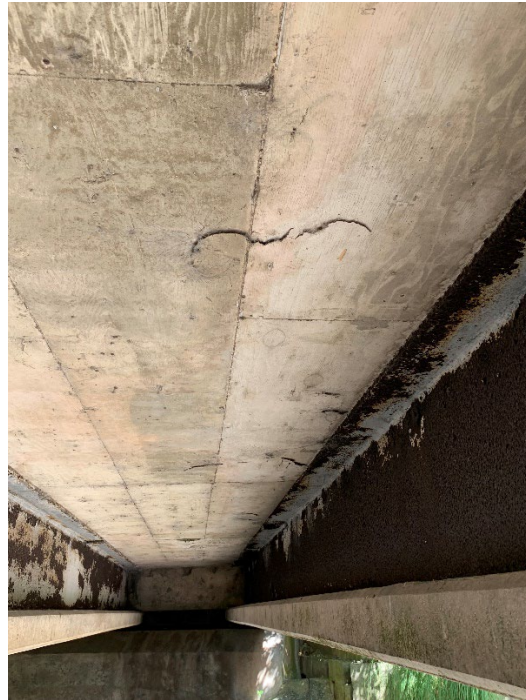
Example of localized spalling to bridge deck soffit
